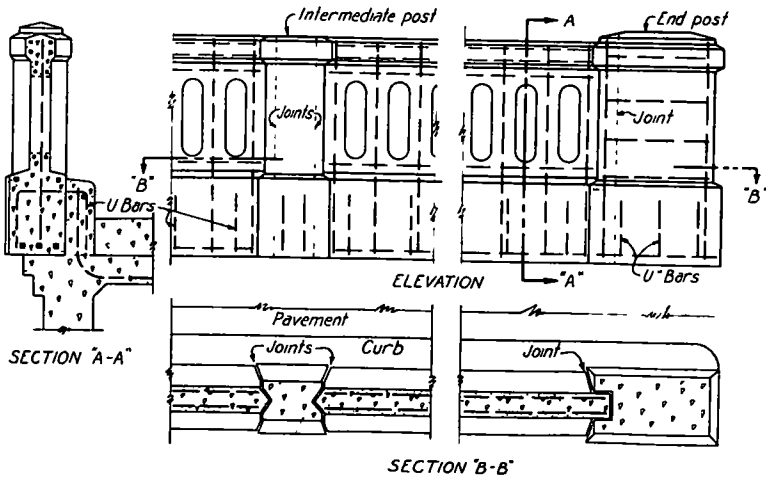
Design of Removable Concrete Bridge Railing. To Detach the Railing the Curb Is Broken Out and the Railing Removed and Replaced in New Position. Constructing a New Curb Anchors the Railing Firmly in Place
